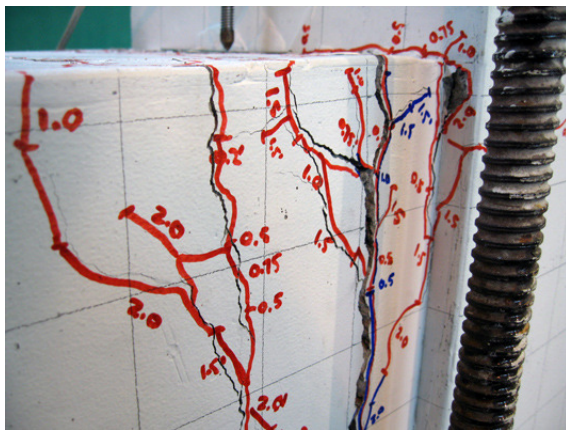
is a photo of strain penetration cracking in specimen SB1. These horizontal cracks extending into the joint were the result of yield penetration of longitudinal bars into the joint, which were observed in all three test specimens. Table 4-7 shows these cracks were wider in the slotted-beam specimens compared to the monolithic benchmark. This is due to more extensive tension-compression yielding of the bottom reinforcement in slotted-beams. When bond-slip failure occurred in interior specimen SB2 at 2.5% drift, this crack widened to 0.75 mm and extended across the entire width of the column.
